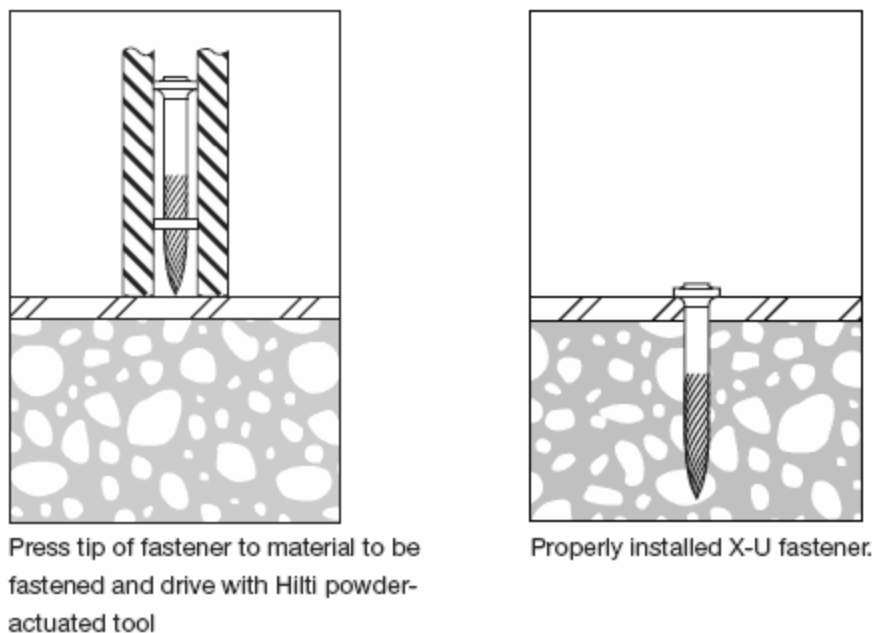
STANDARD INSTALLATION PROCEDURES FOR X-U FASTENERS IN CONCRETE
